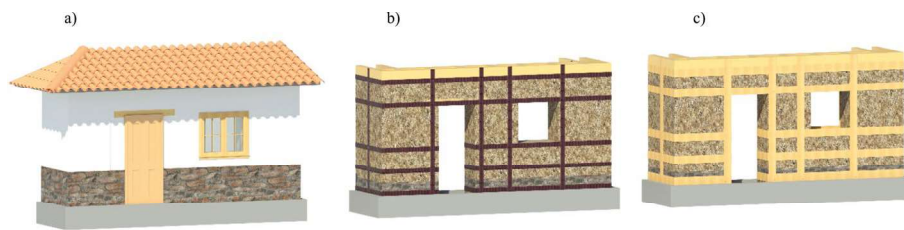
Retrofitting strategies for RE and Adobe buildings: a original house, b confinement steel strips, c confinement wooden elements
